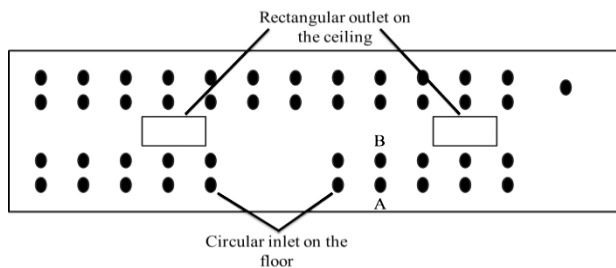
Arrangements of inlet and outlet diffusers in mixing ventilation
